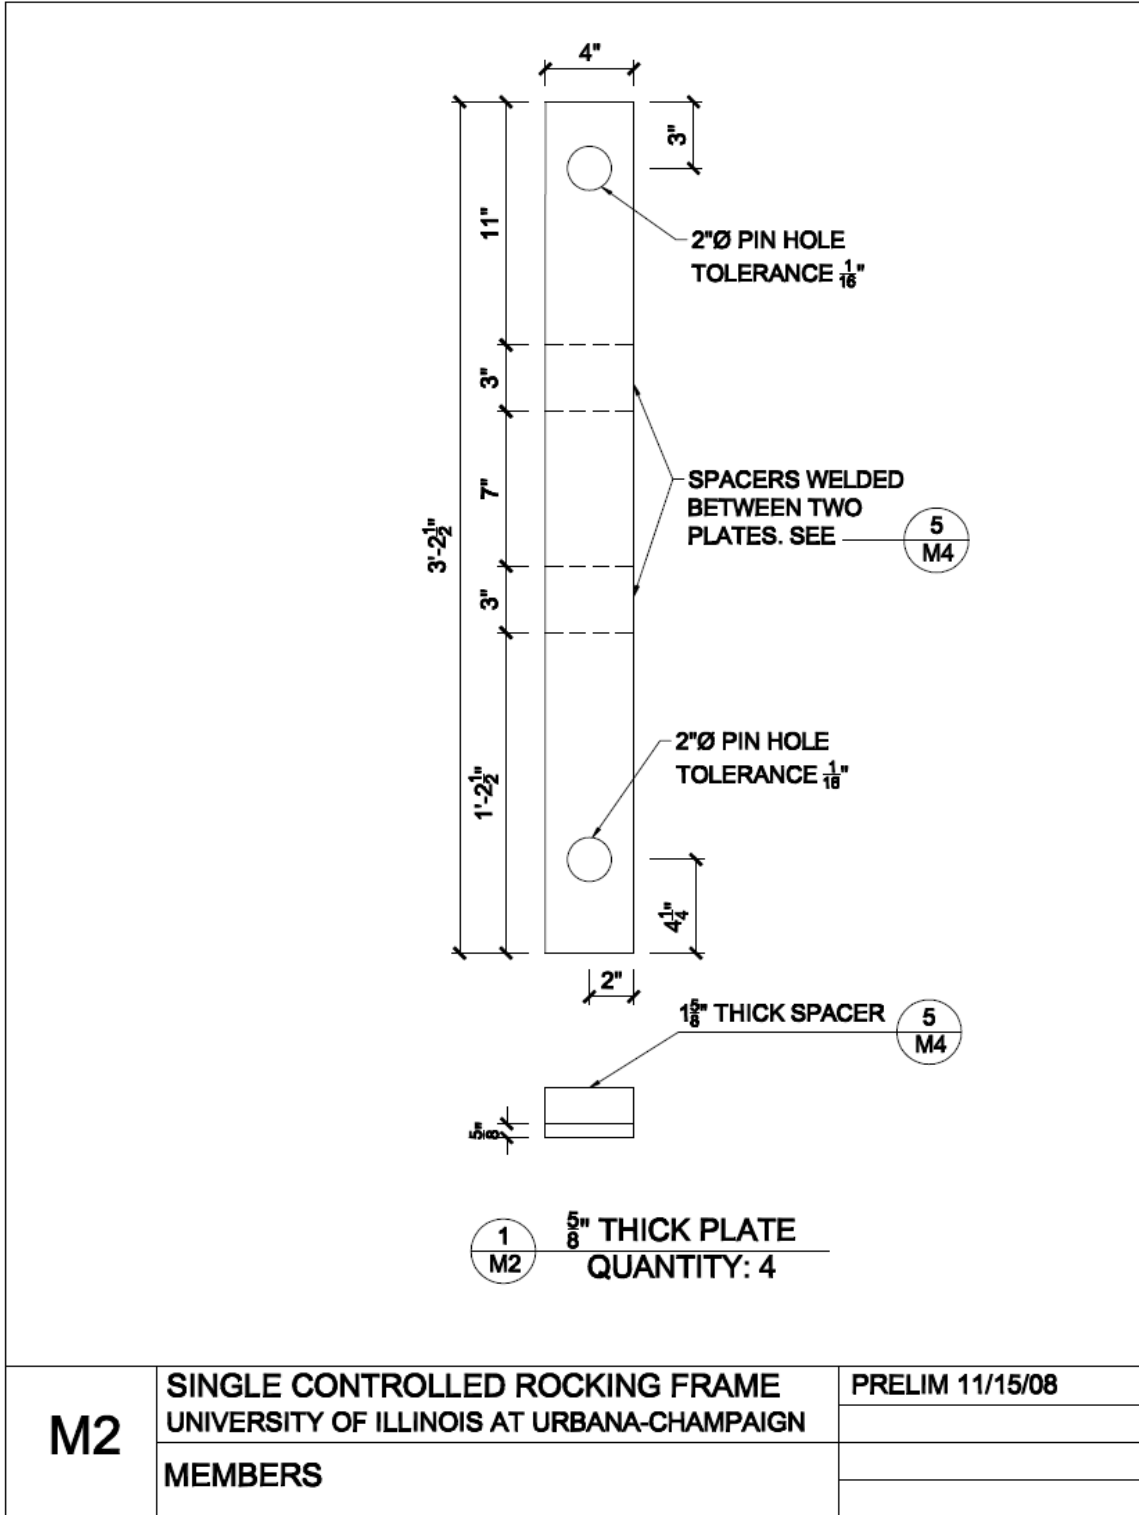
Design Drawing for the Single Frame Configuration – Fabrication Pieces
